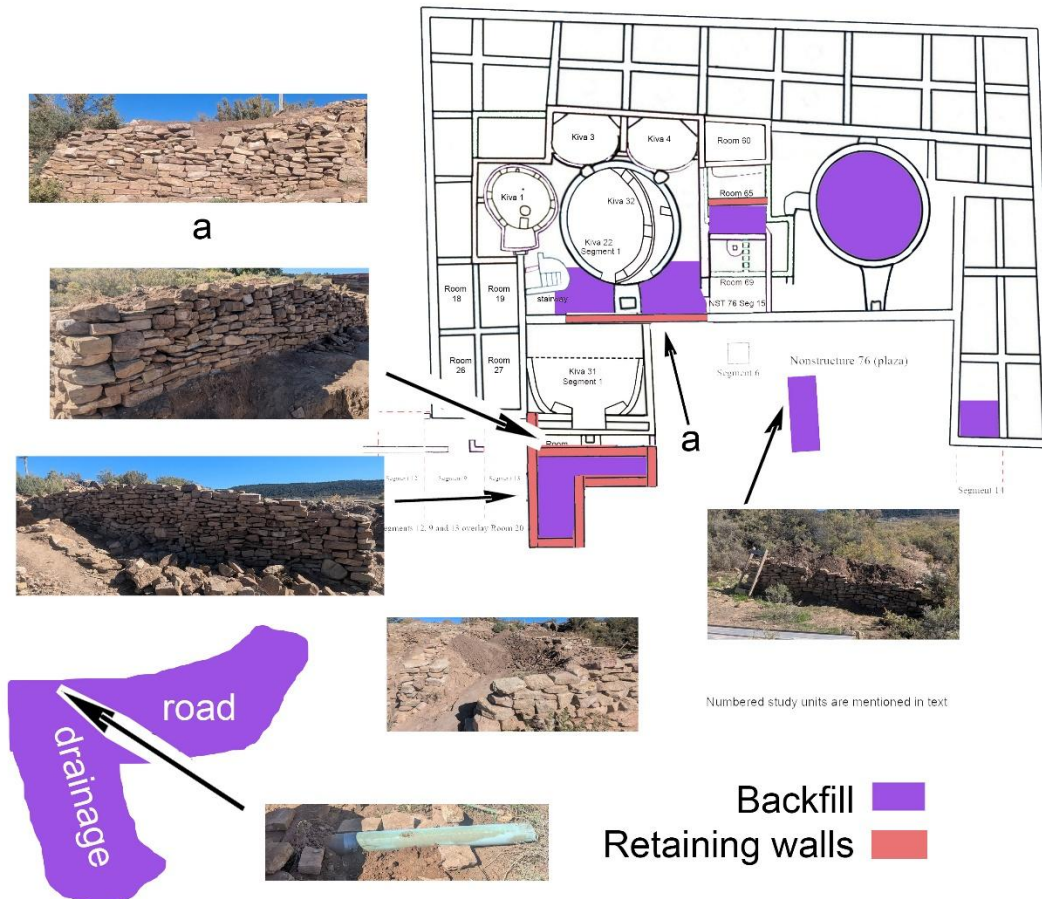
Back filled areas in 2025 and new dry-laid retaining walls.
